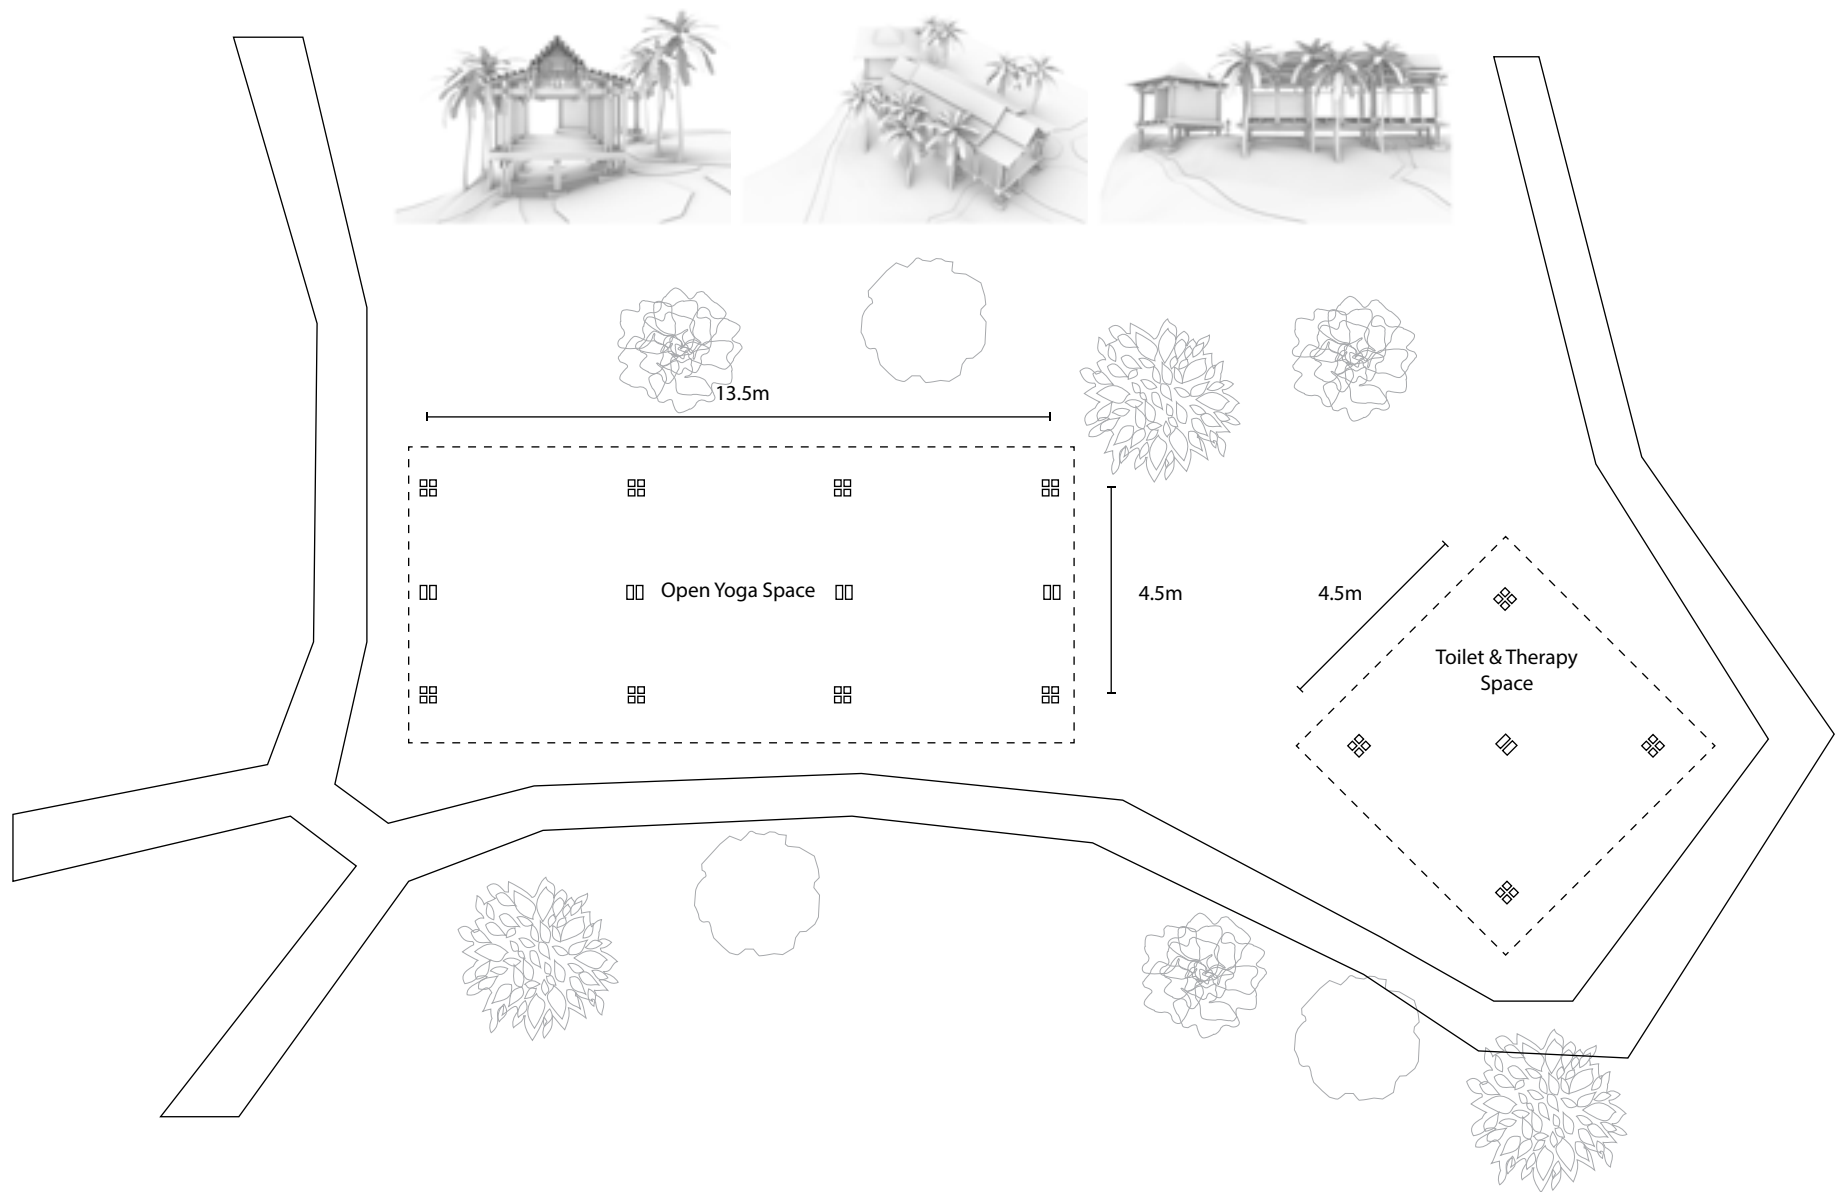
Precedent 2- 2020 Proposed Building Containing a Yoga Shala and Therapy Space (adapted from DSGN with permission from Jack Lehane and Seán Conlan-Smith)
